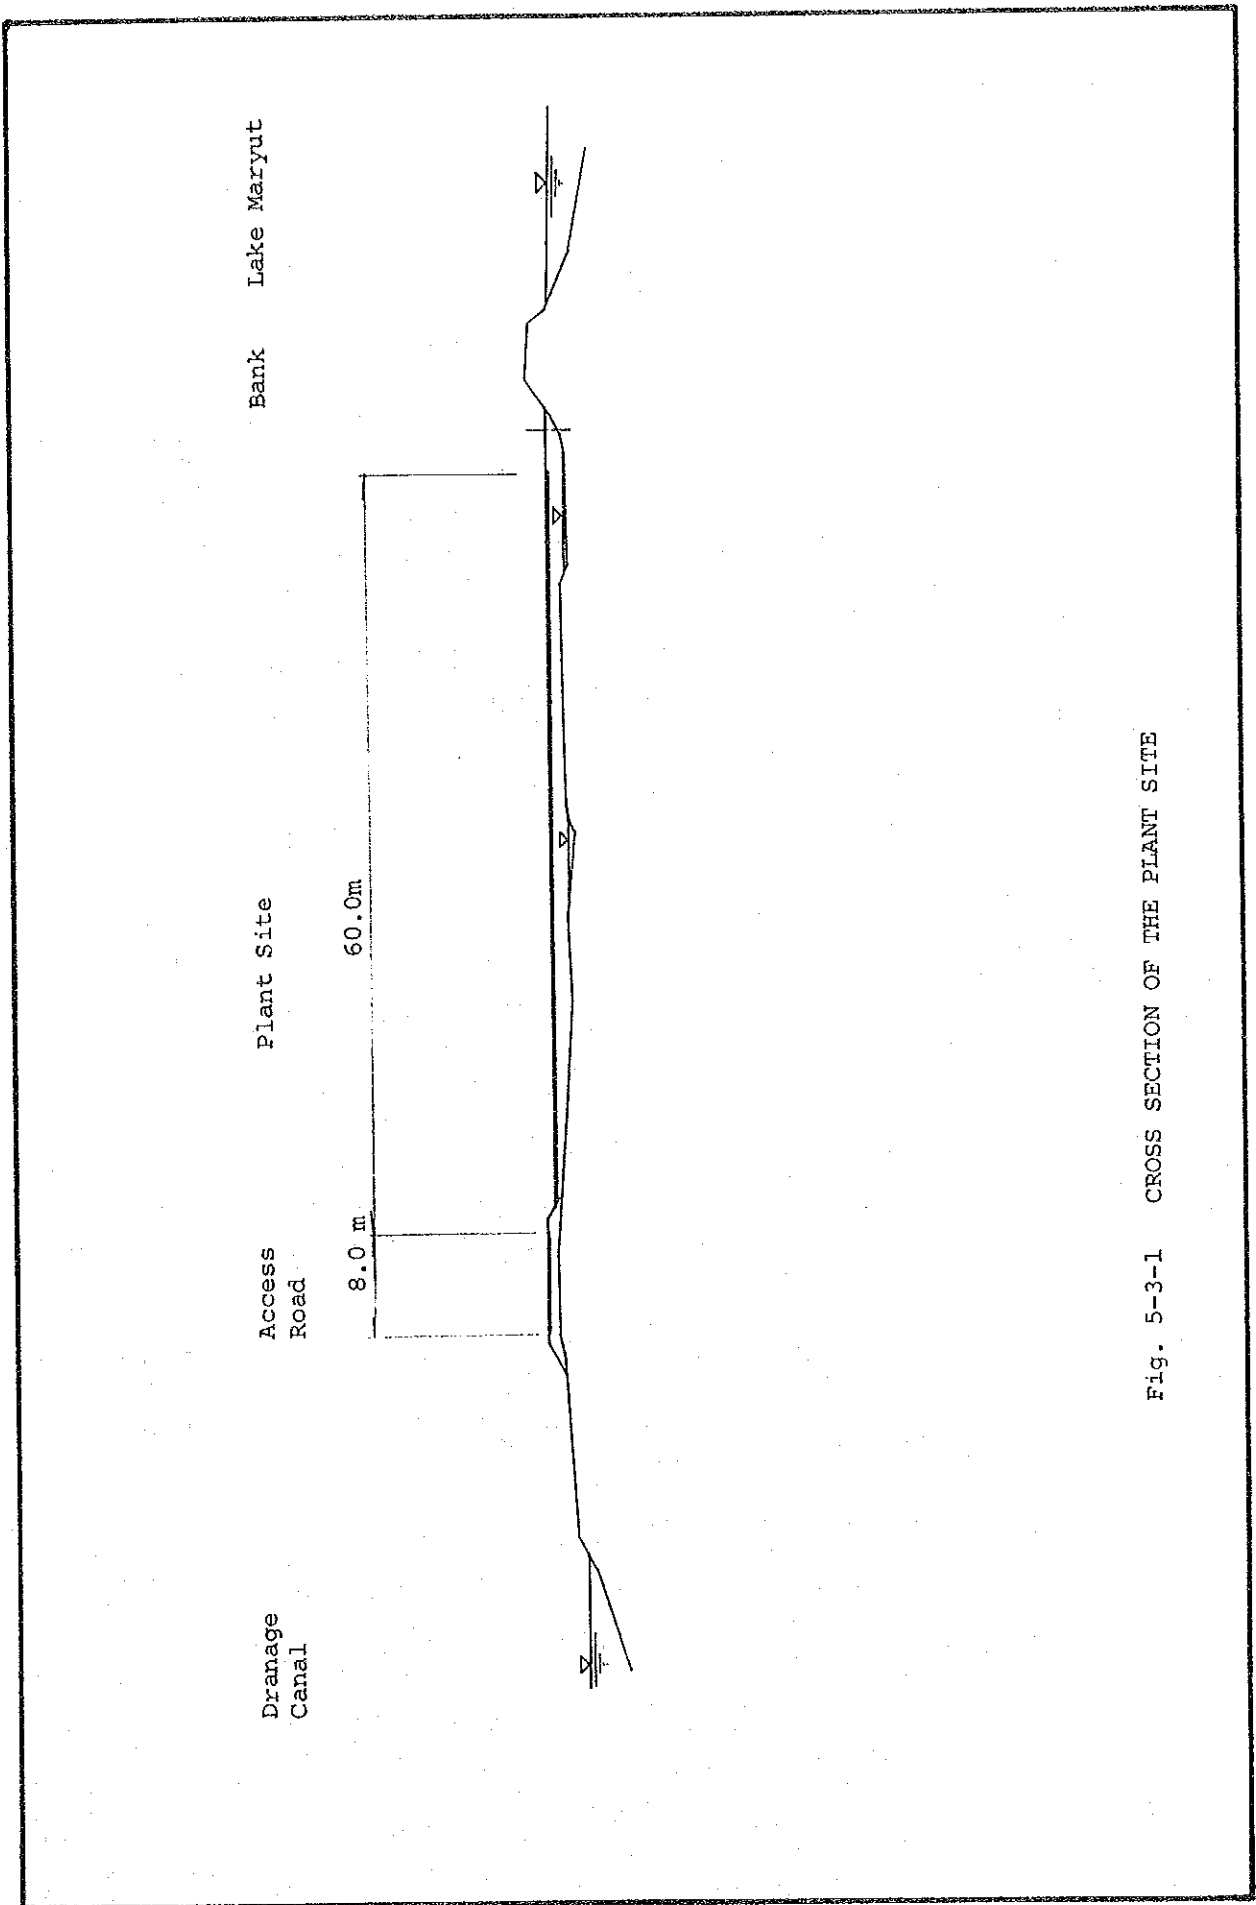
CROSS SECTION OF THE PLANT SITE
